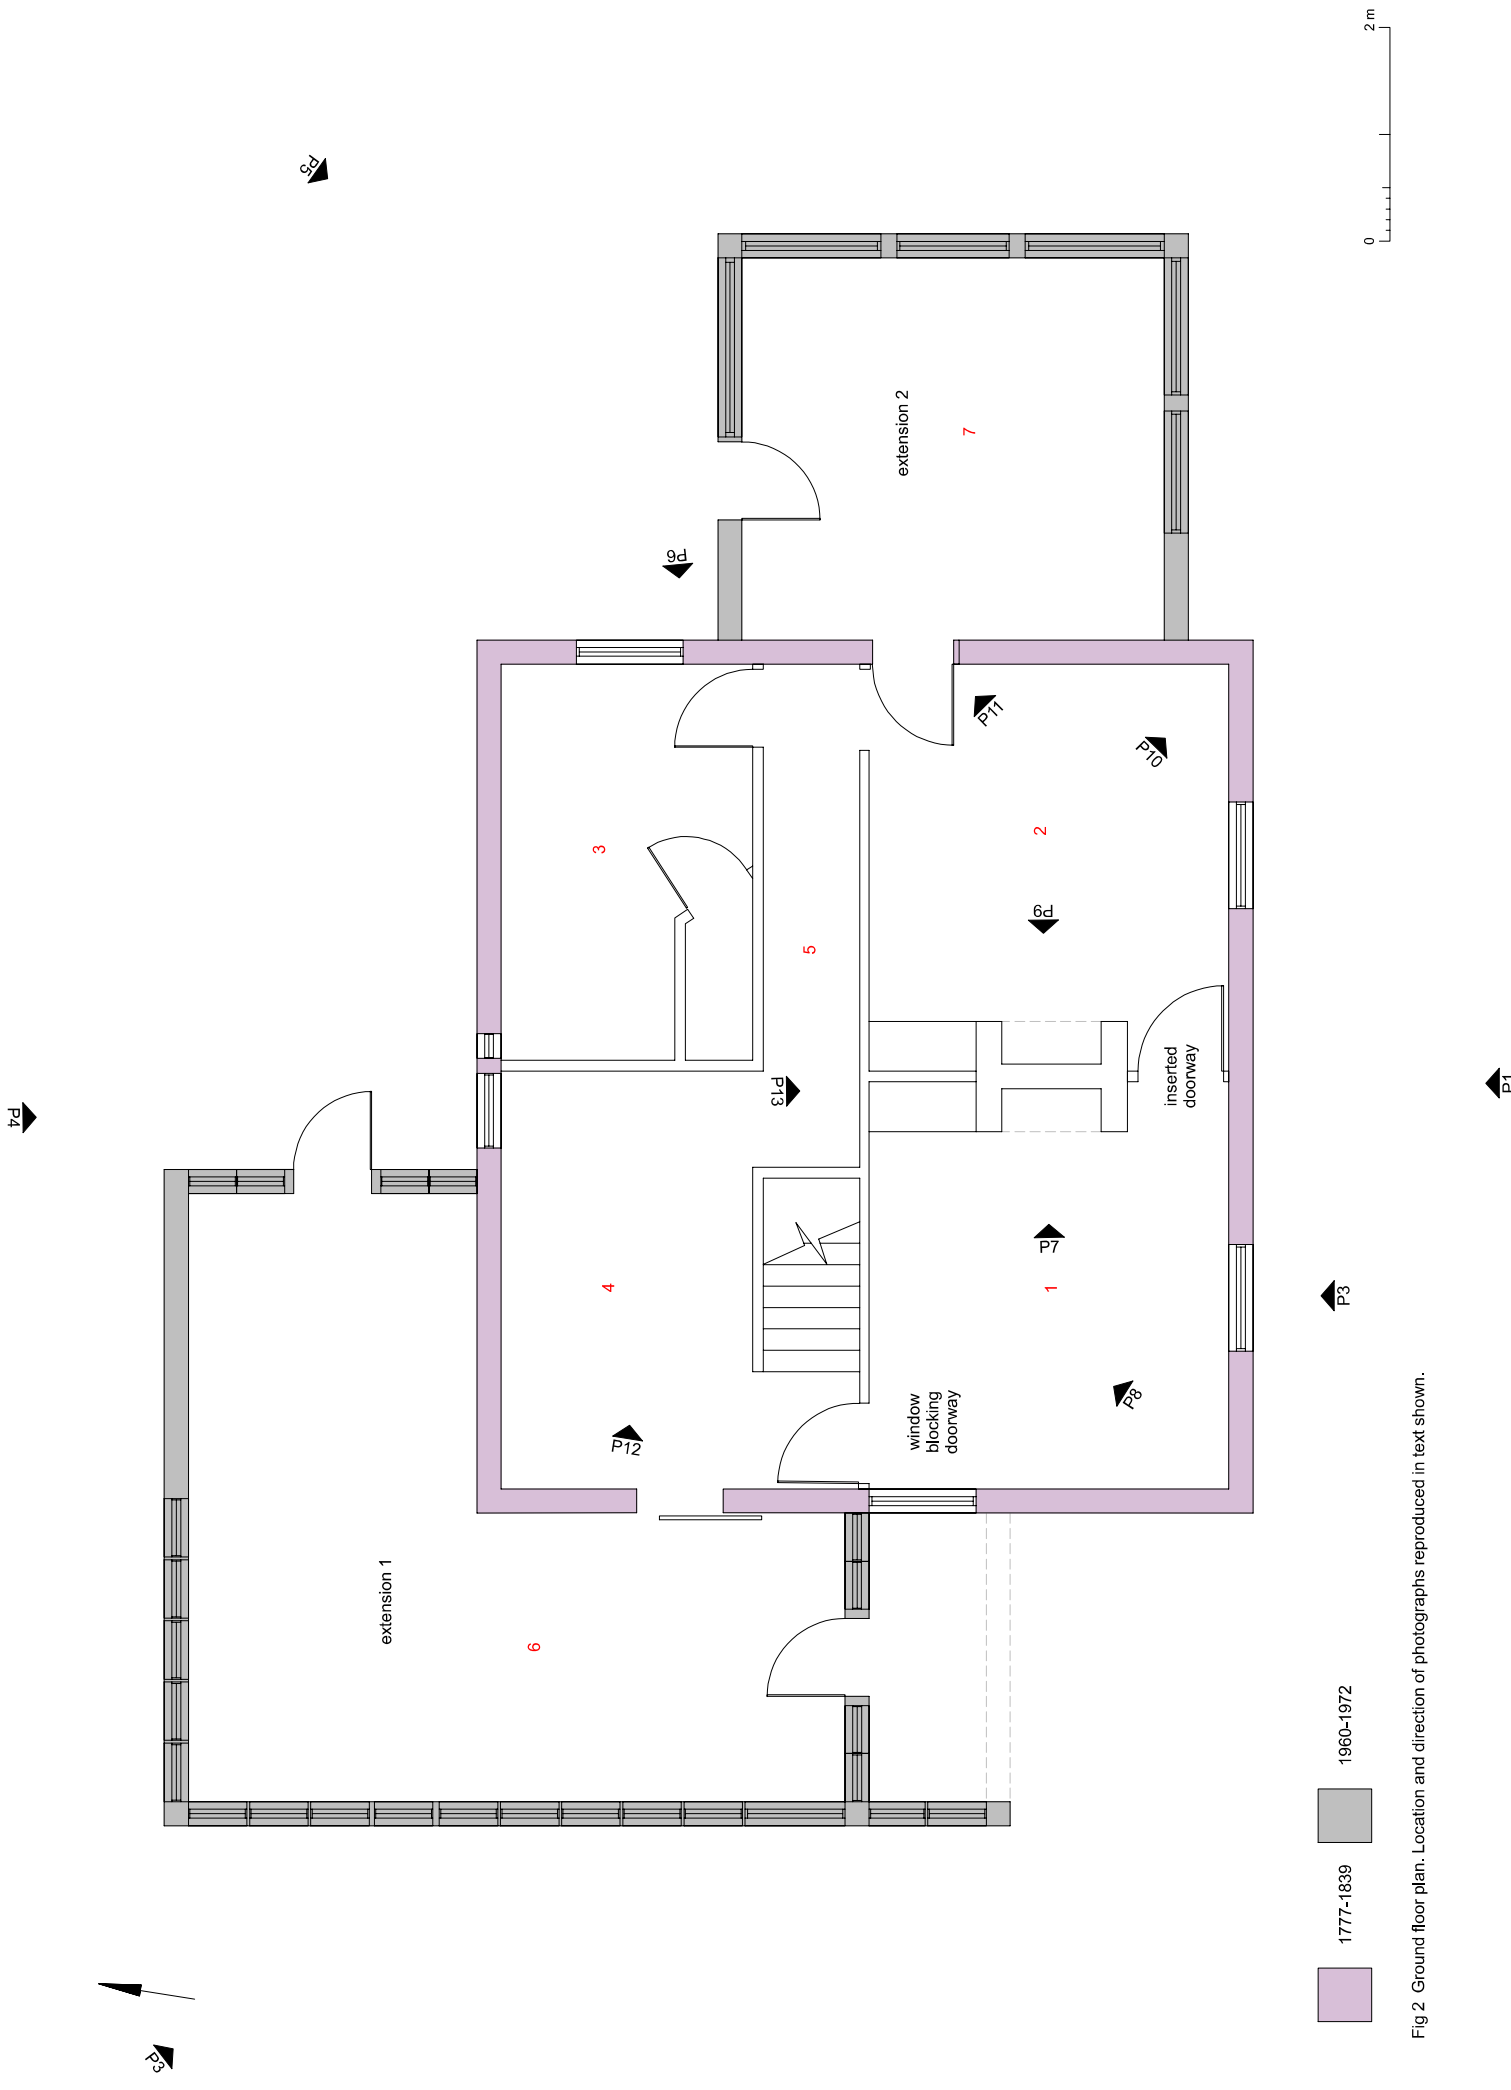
Ground floor plan. Location and direction of photographs reproduced in text shown.
